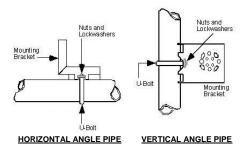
Flat and Angle Mounting Brackets secured to Horizontal or Vertical Pipe
